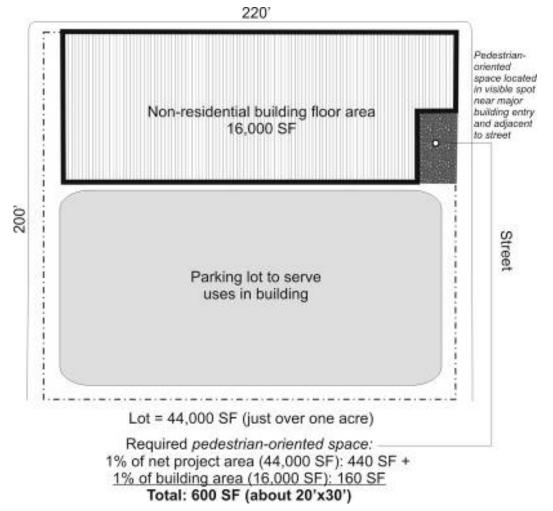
(a). Illustrating the amount of open space required for non-residential development.
